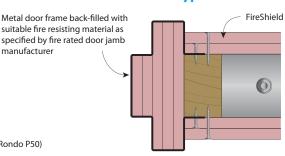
Fire Rated Metal Door Jamb Example only – Plan view
